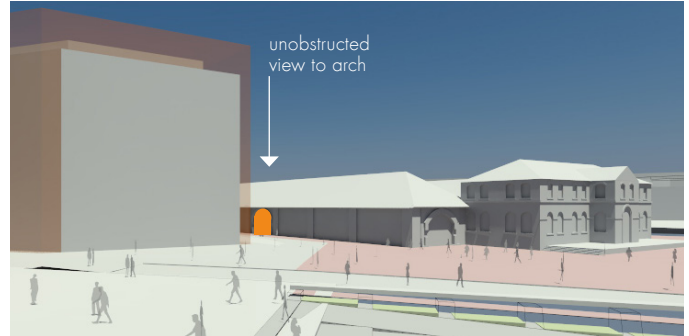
View from station exit looking towards NRM with unobstructed view of existing archway
